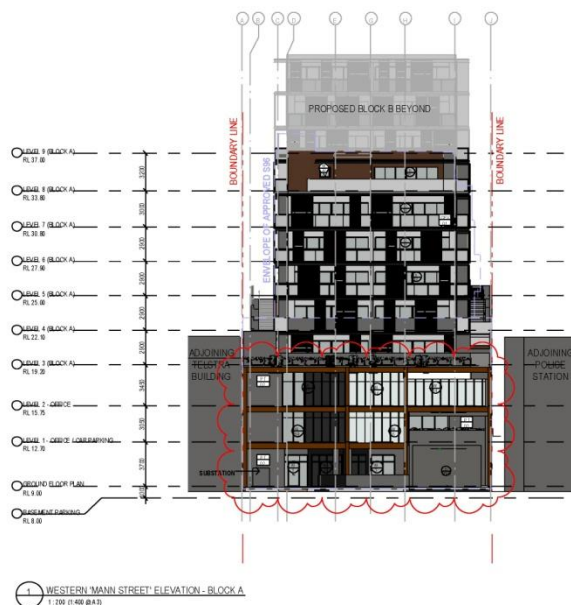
17 Mann Street DA Submission, Mann Street elevation (source Gosford Council web site)
